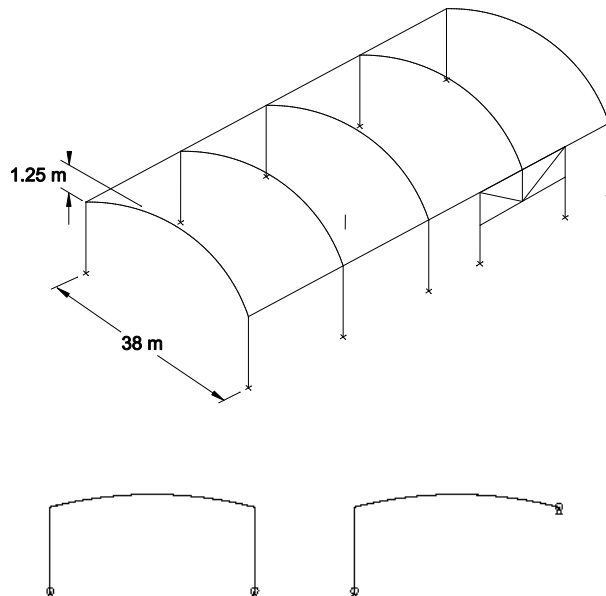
c. Structural frame showing standard frame and frame at door.
